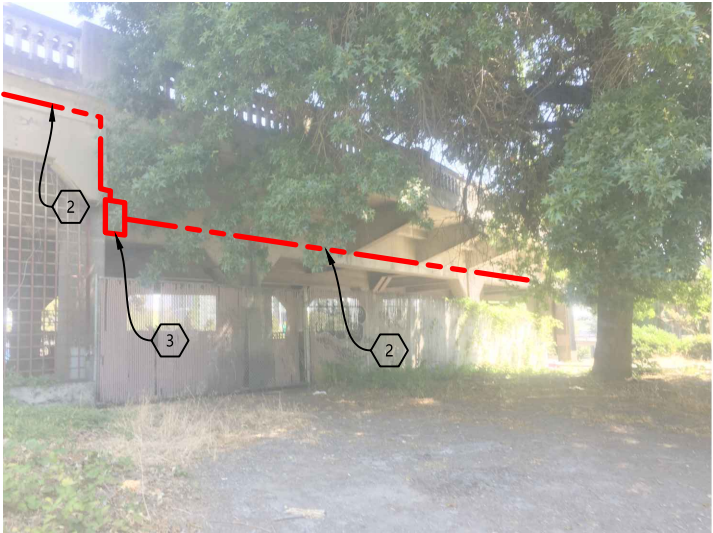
FACING WEST ON SOUTH SIDE OF BRIDGE EAST SIDE OF WILLAMETTE RIVER
